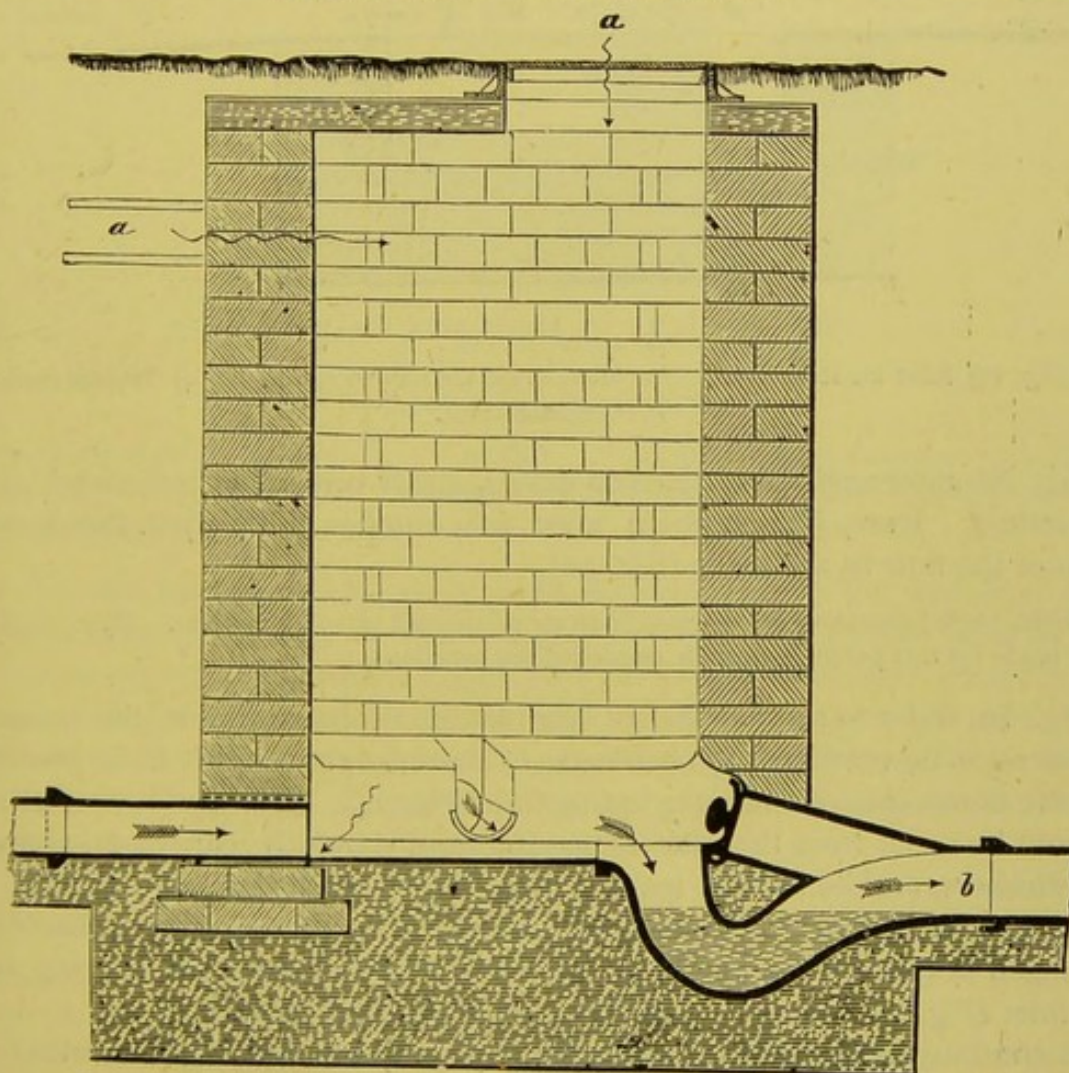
SECTION OF INSPECTION CHAMBER.
